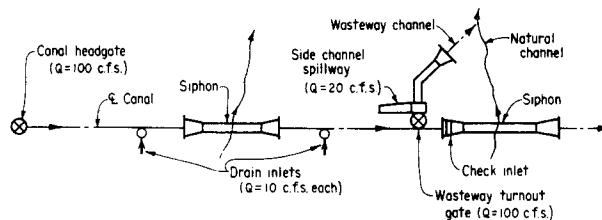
General plan of typical canal with side channel spillway. 103-D-1295
